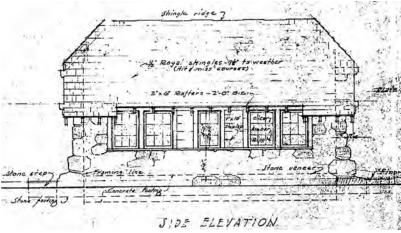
Large stone walls on the side and rear façade of Comfort Station (CS3021) (source: Anderson Hallas Architects, 2019).
